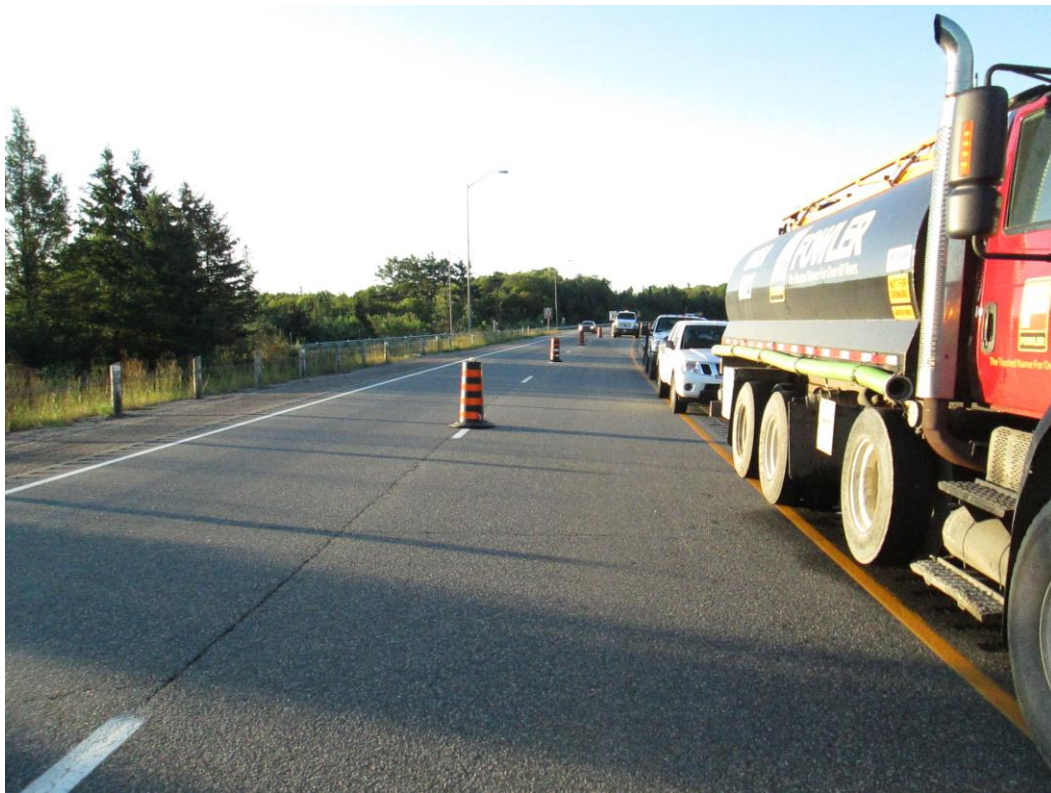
Hwy 11 NBL looking south from proposed culvert location
